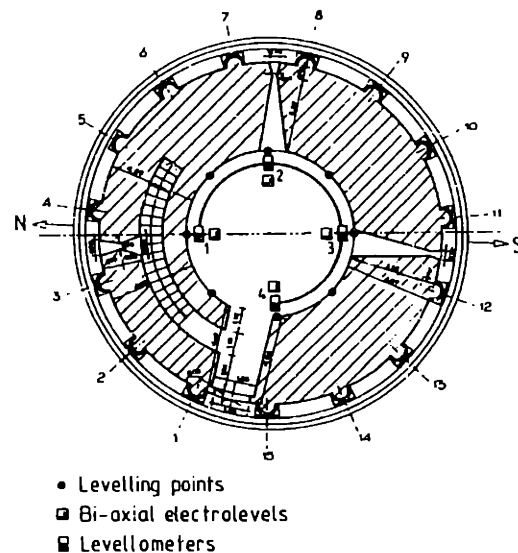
Plan section of the entrance chamber of the Tower of Pisa showing the location of instruments (Burland, 1995).
